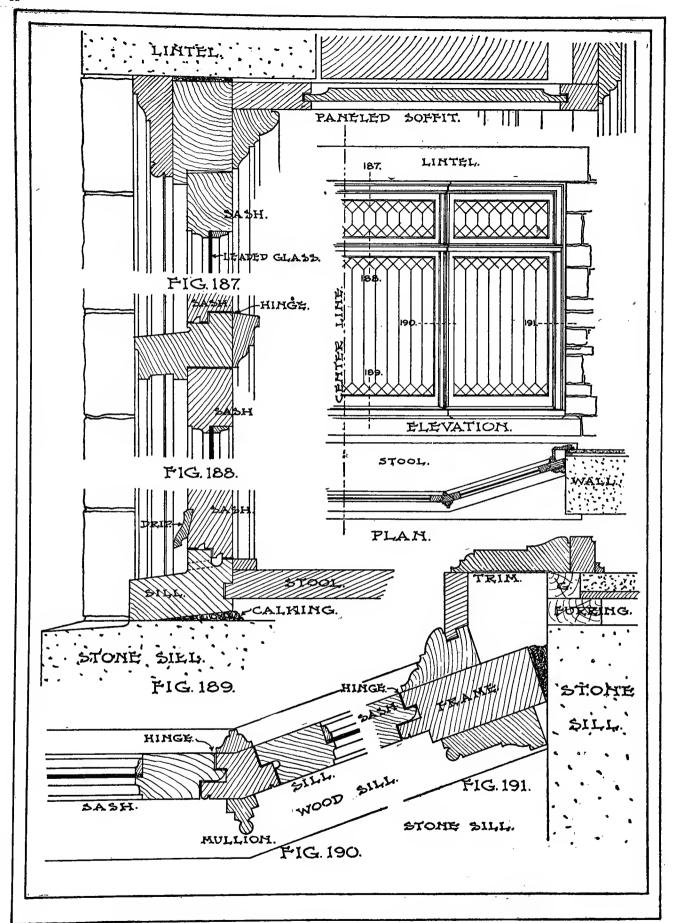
INWARD OPENING CASEMENT BAY WINDOW
